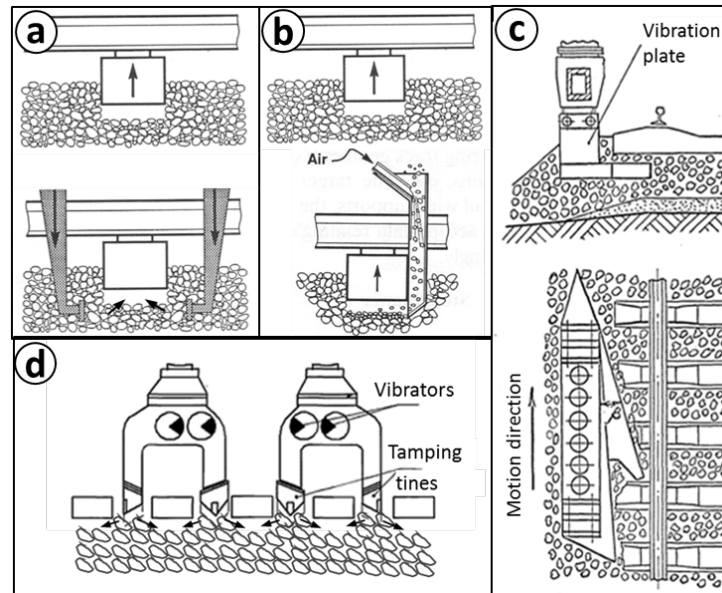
Principal schemes of railway ballast machine tamping: a - conventional tamping technology of Plasser and Theurer [3]; b - stone blowing [3]; c - side tamping technology of machine type VPO [40]; and d - vertical tamping technology of Robel [40, 41]
